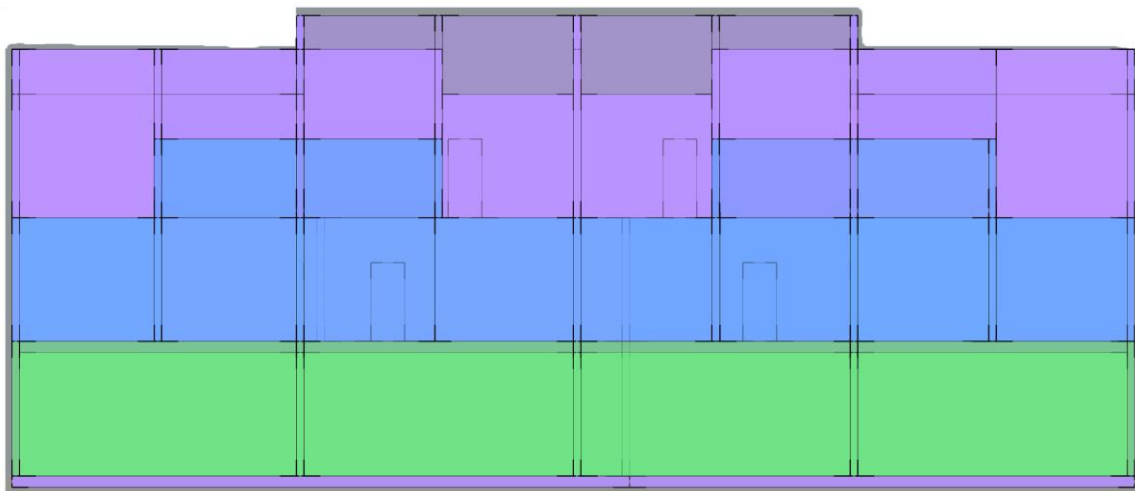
Building B North Section Showing Vertical Distribution (green = retail, blue= level 2 entry units, purple = level 3 entry units)
